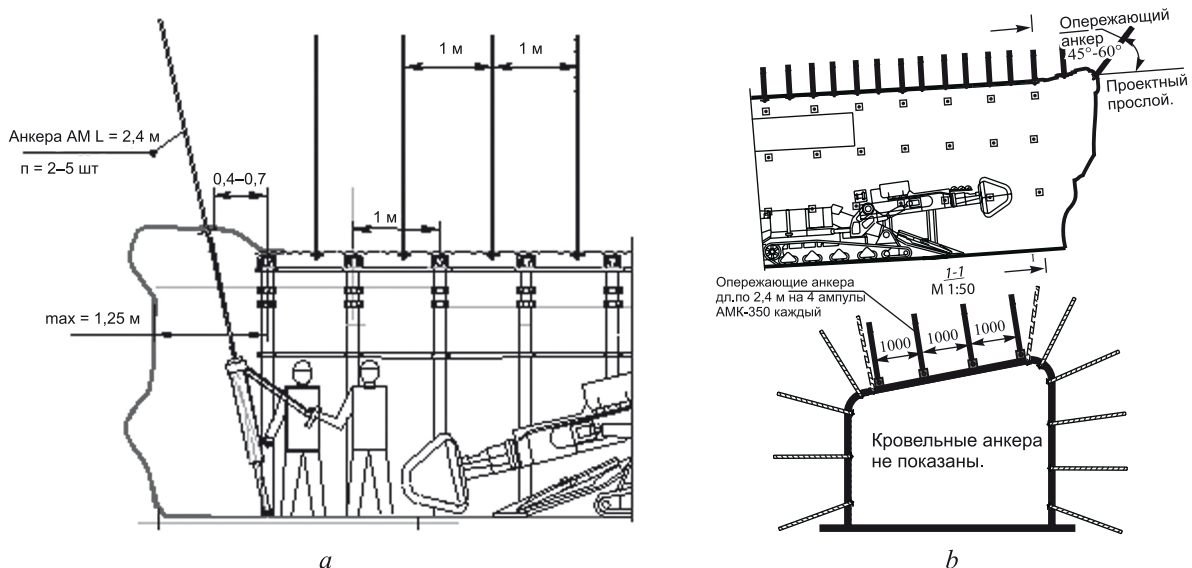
Specification of using the front line support with the unstable roof (Saranskayamine, Karaganda coal basin): a – erection process; b – technological scheme: longitudinal view and cross section
